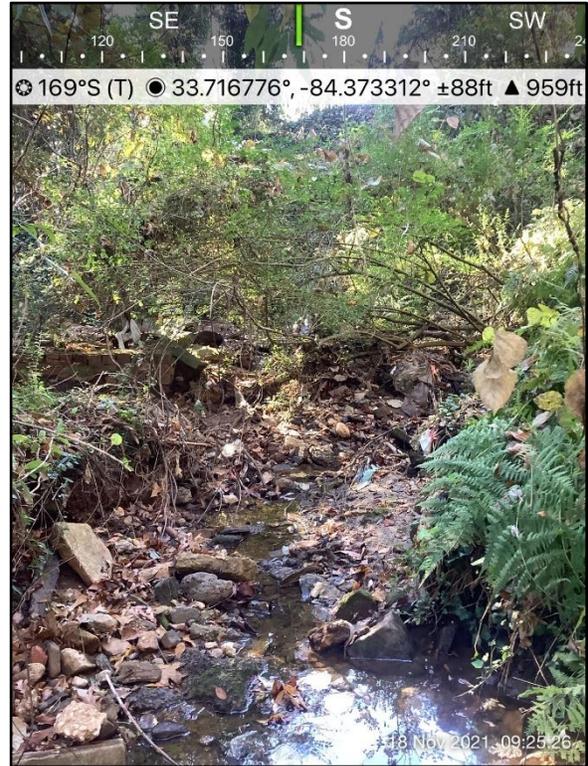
Primary culvert structure draining to Stream 1 looking upstream at erosional plunge pool and relic culvert structure in the foreground
